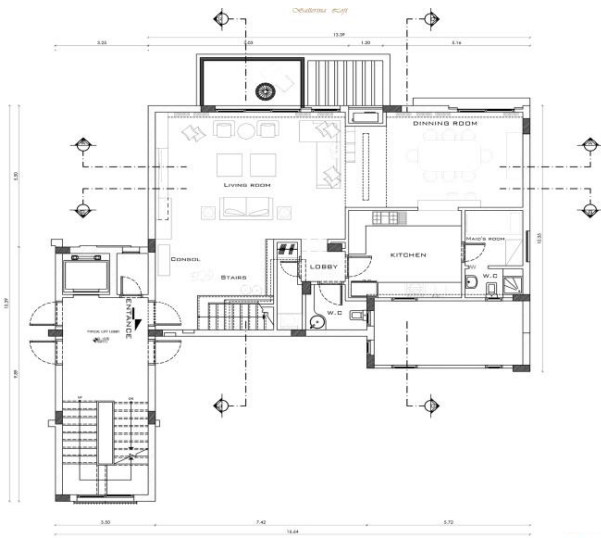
((Author, 2018)): A furniture floor plan of a soft loft design.
